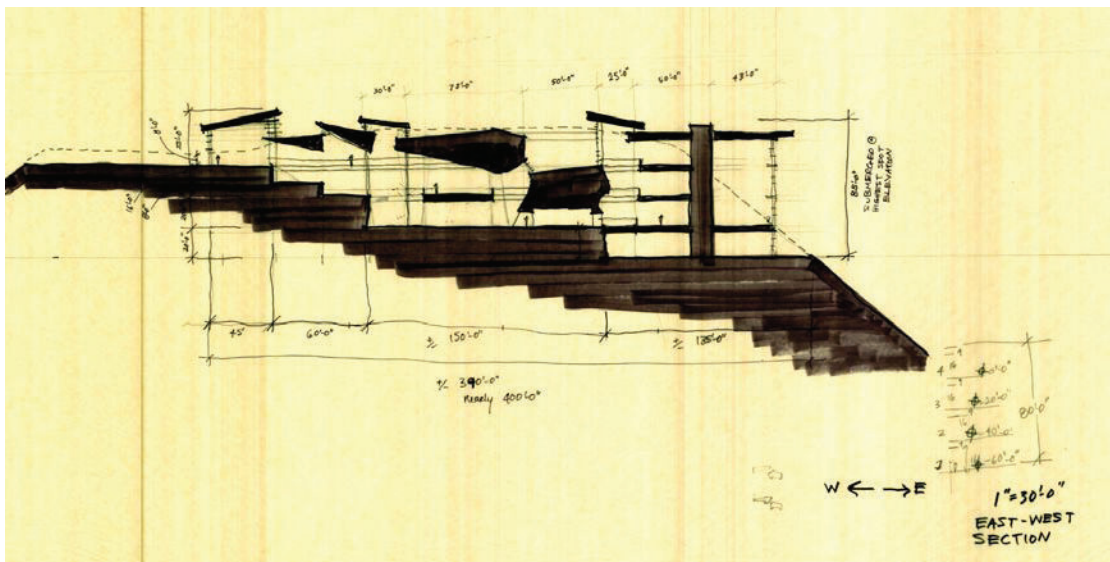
Section view speculative design 3. [Drawing by Emily Childs]
